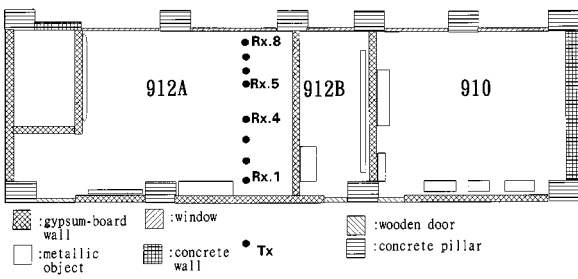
Layout of measurement site No. 2. There are eight receiving positions. The patched-wall model is used to describe the surrounding walls of the receiving positions, which is at room 912A ($8 \times 6 \times 3$ m)
